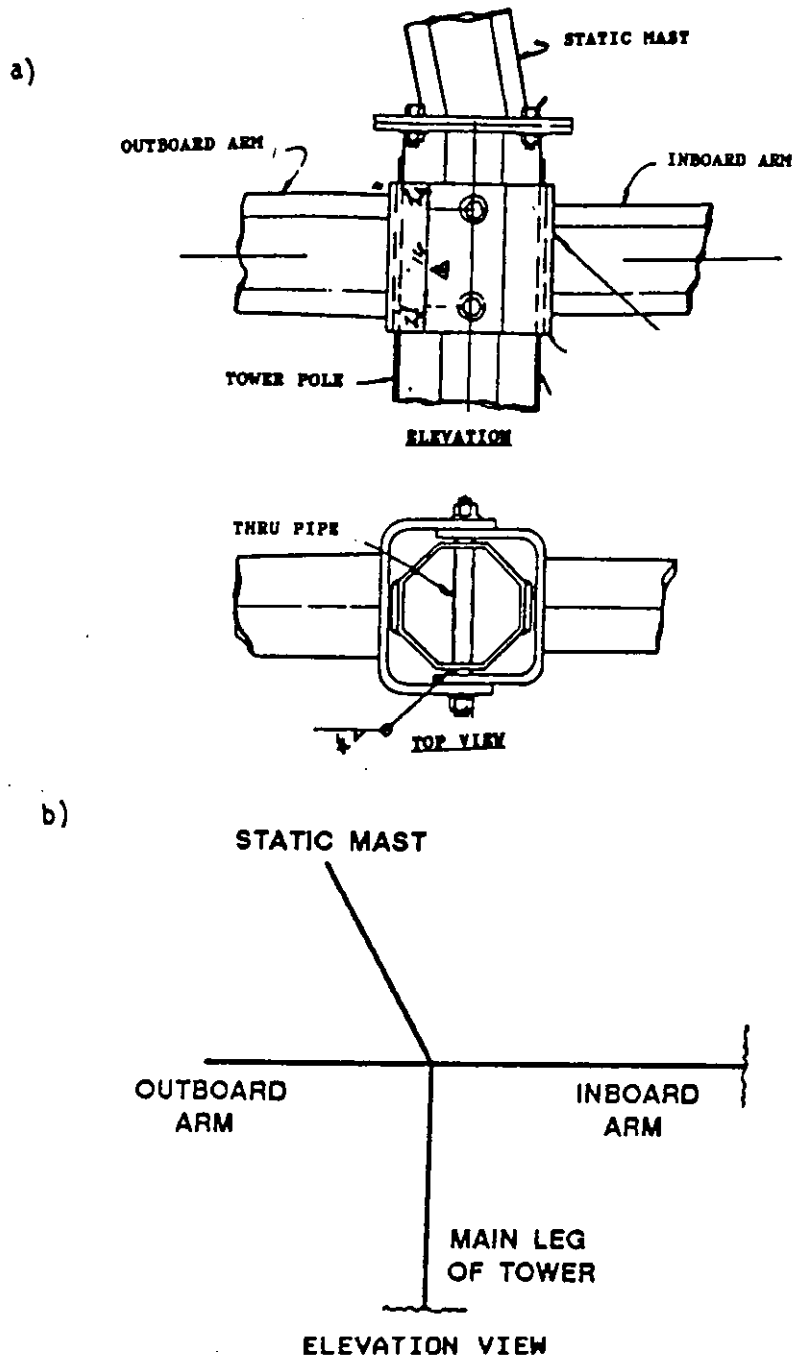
A typical joint of the inboard arm, outboard arm, static mast and tower leg; a) elevation and top view of joint, b) finite element idealization of the joint.
